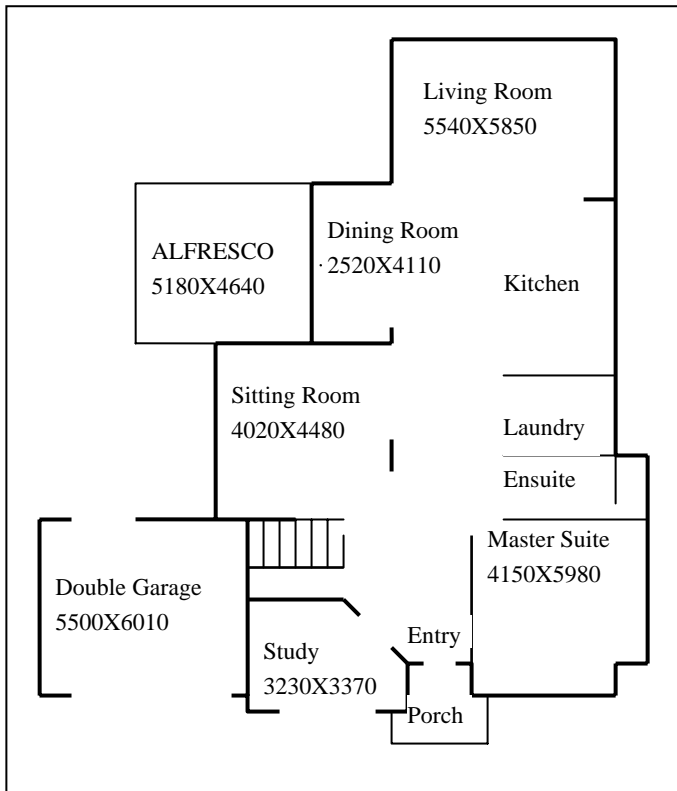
Simplified Floor plan of Ecohome (ground floor)
